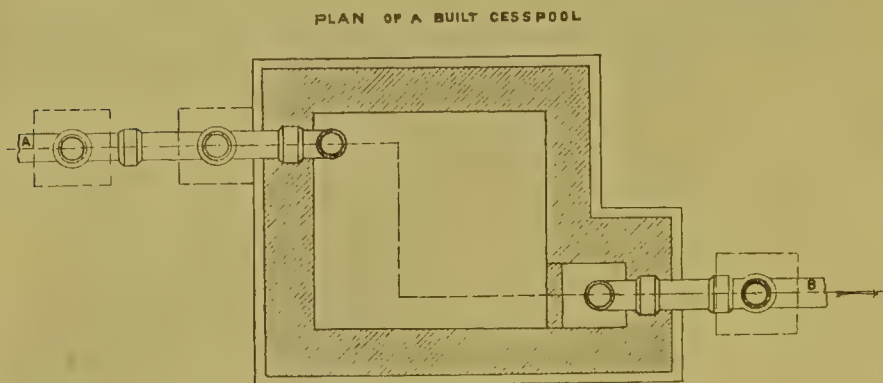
is a Plan of a Built Cesspool or Inspection Chamber. The cesspool is constructed of concrete. By the fireclay pipe-channel A the sewage enters, and by the like channel B it leaves to be disposed of or purified. The top of cesspool is covered by a solid iron plate which can be removed for the purpose of cleaning the cesspool. (Model Regulations of Plumbers.)
